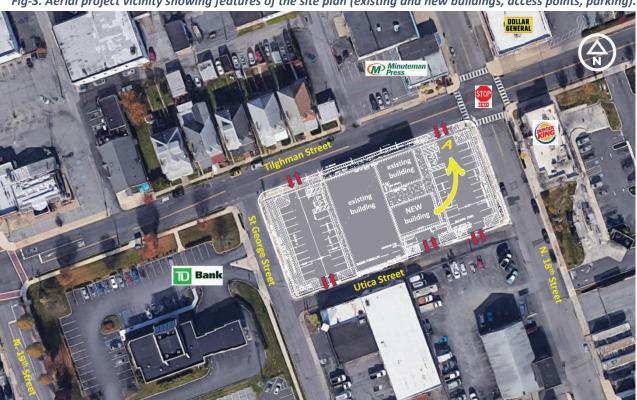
Aerial project vicinity showing features of the site plan (existing and new buildings, access points, parking).
